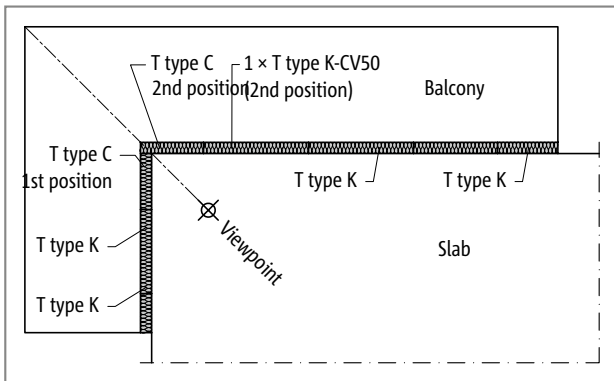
Schöck Isokorb® T type C: Balcony with outside corner freely cantilevered
